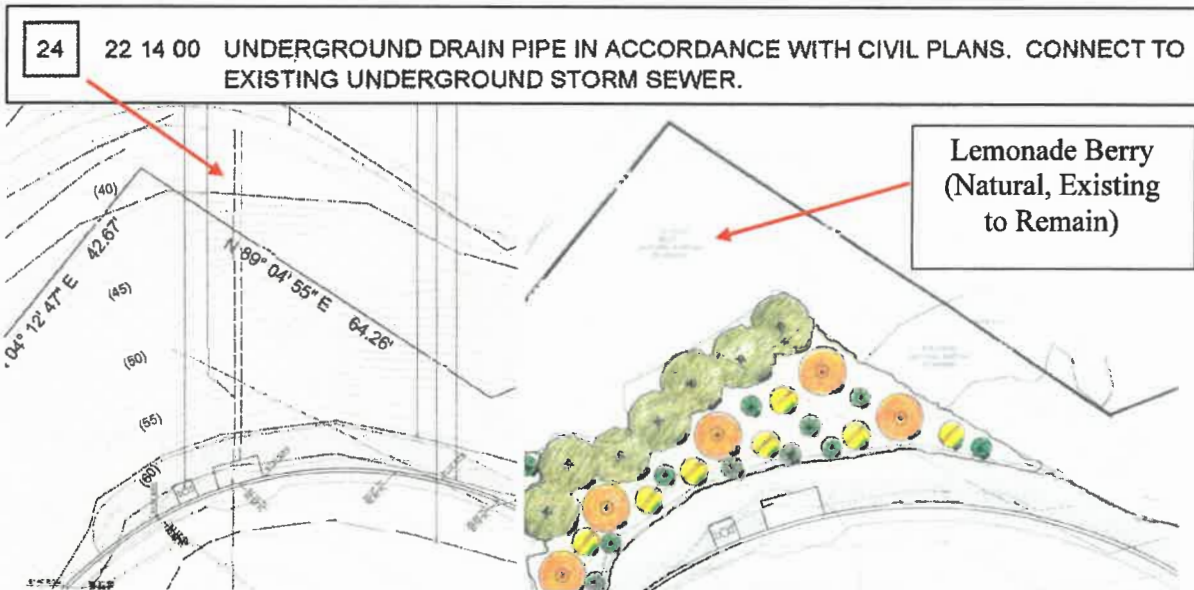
Left: Depiction of drain pipe proposed to be installed down the slope north of turnaround. Right: Detail of landscape plan identifying area as lemonade berry that is to remain. Top: Plan note describing underground drain pipe to be installed through lemonade berry scrub that is “to remain.”
